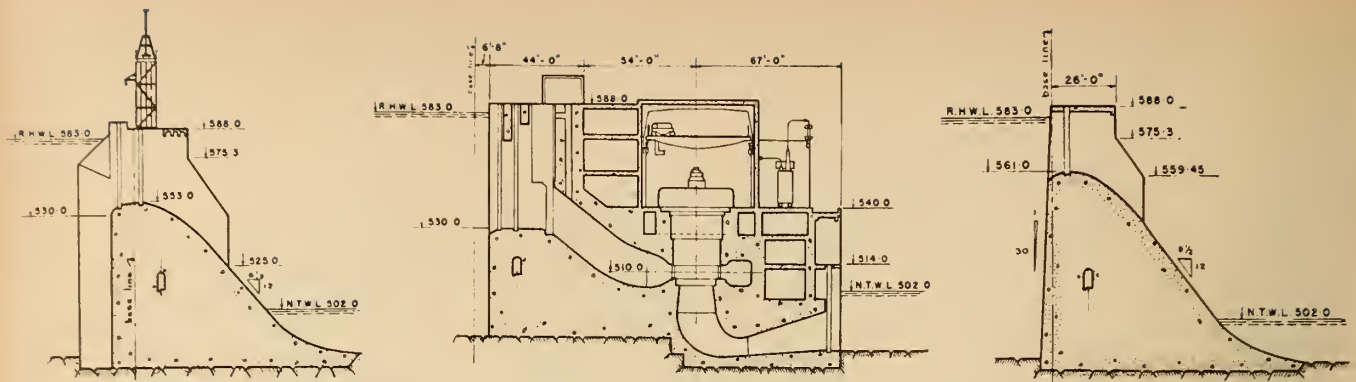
Structure cross-sections at La Cave. Left, sluice section. Centre, power house section. Right, stoplog section.
